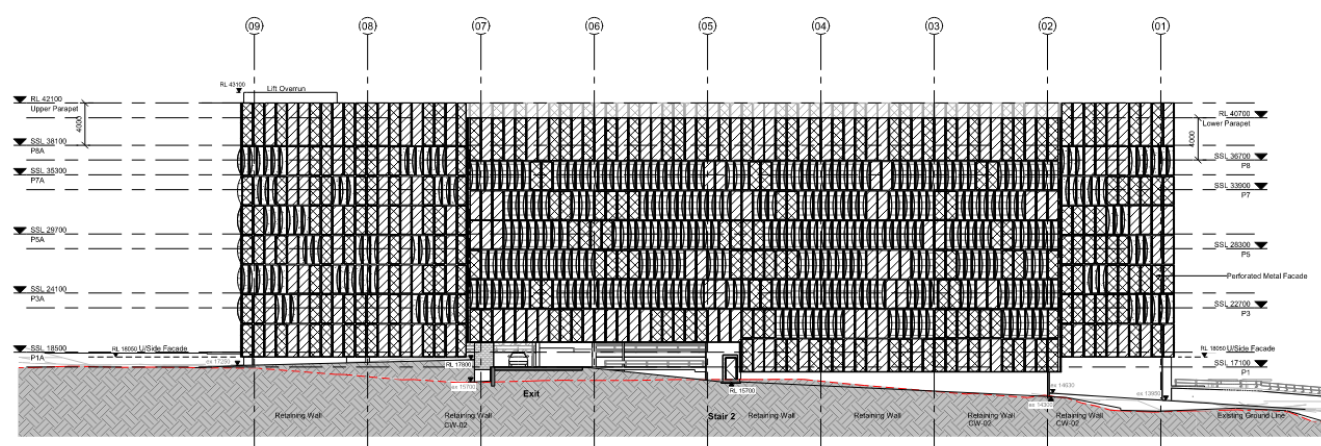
East elevation section of MSCP (Source: BLP dated 14/12/20)
